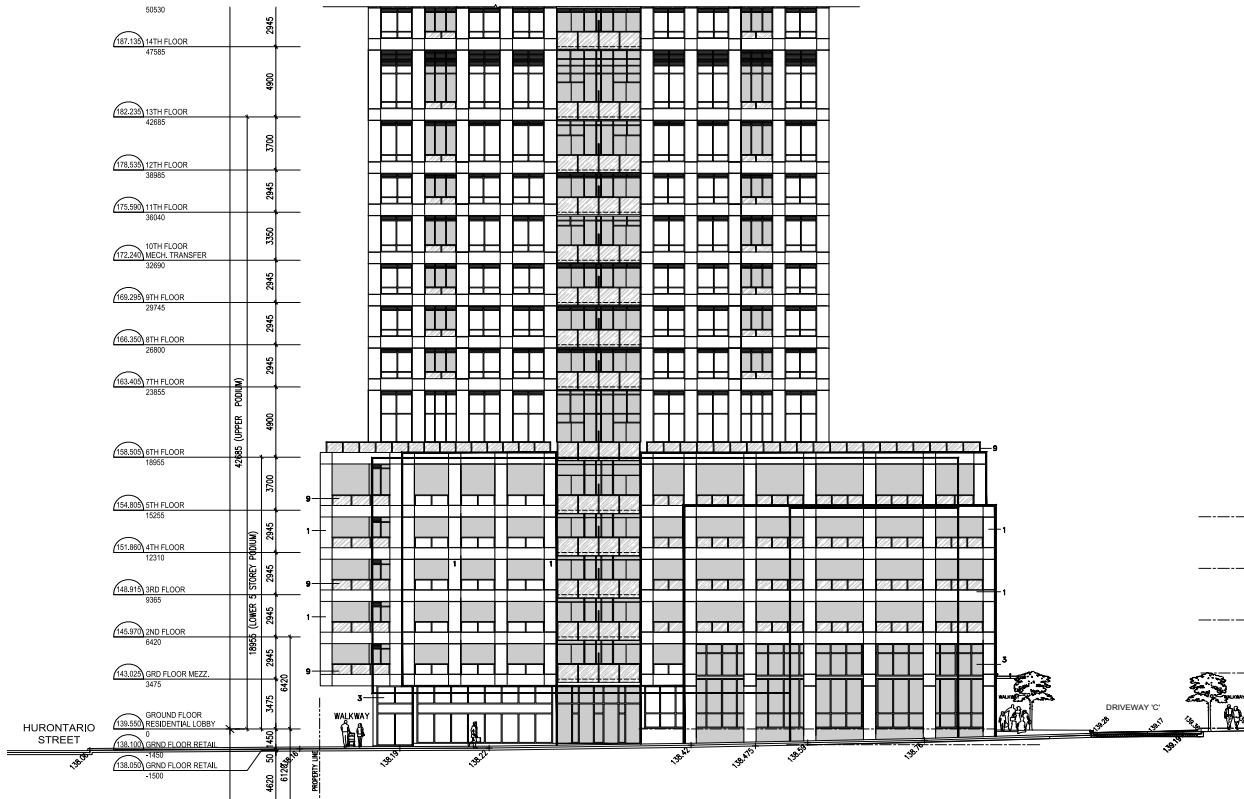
North Elevation of Podium From Elm Drive West
